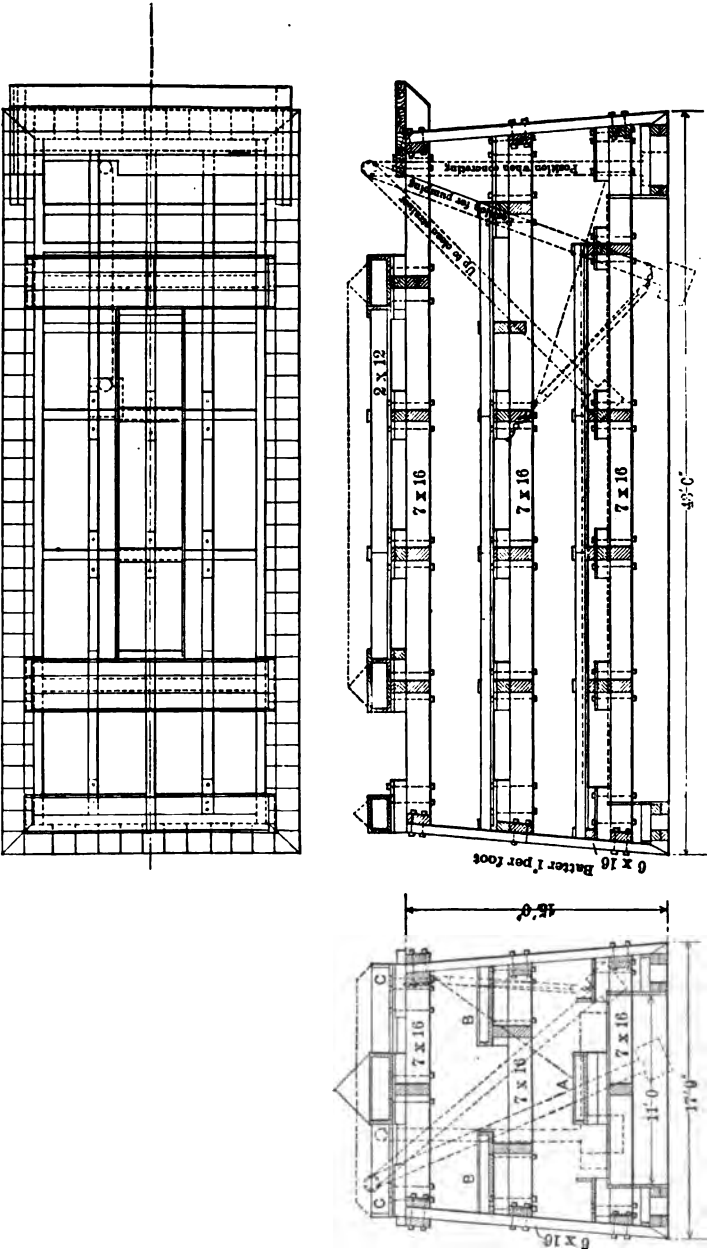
CRIB COFFER-DAM, ATCHISON, TOPEKA AND SANTA FE RAILWAY.
